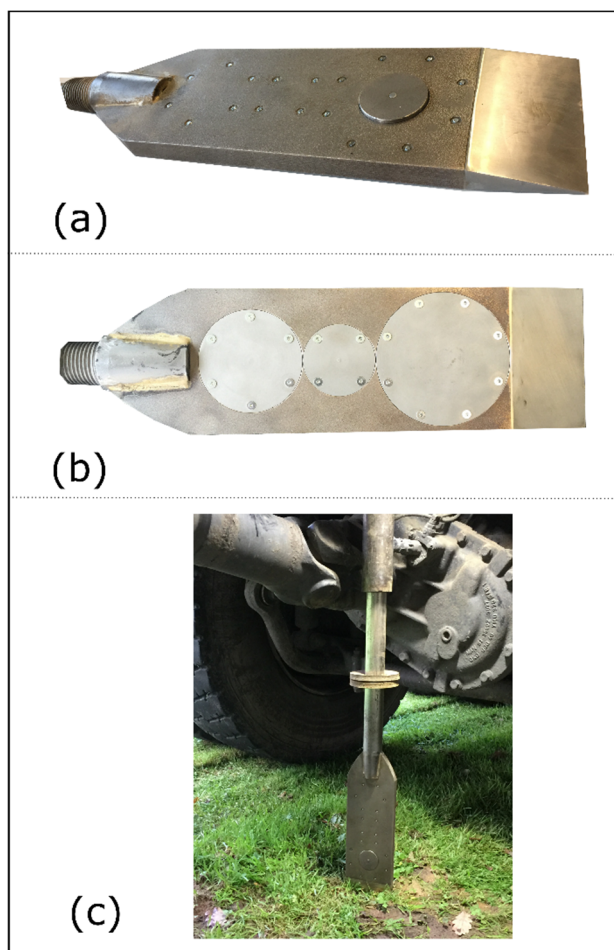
Assembled instrumented dilatometer: (a) piston expansion in an angled view; (b) bottom view; (c) assembled with a truck-based penetrometer.
